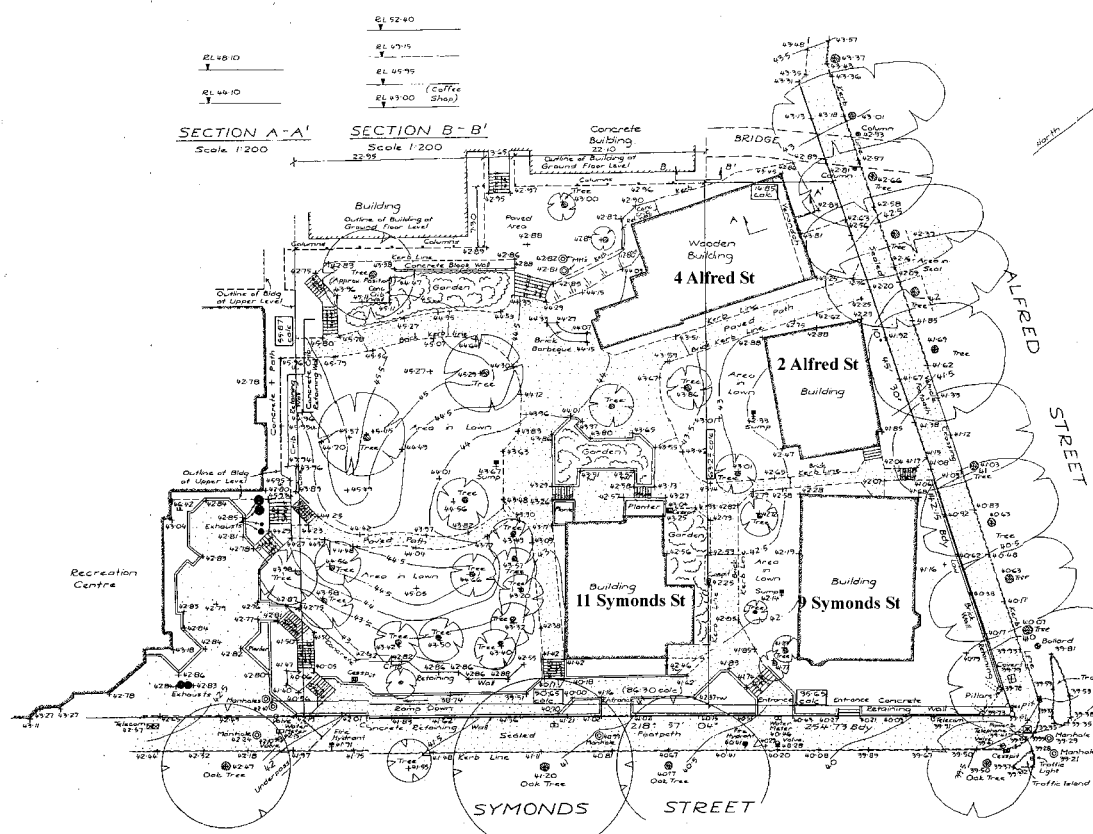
Student Amenities development site prior to the removal of the 19th century buildings, showing their location
